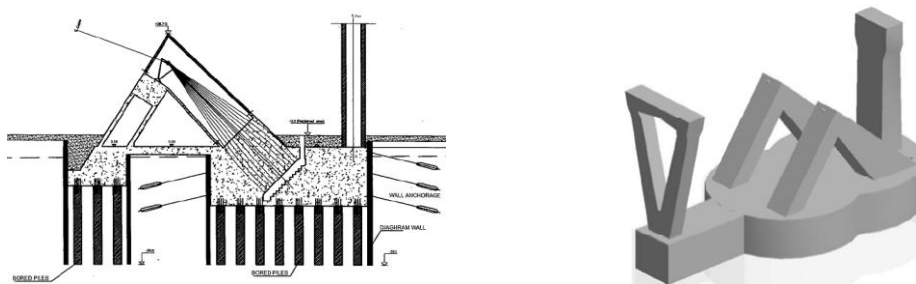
(a) Conceptual design of Tender design for South anchor block; (b) Alternative plan
